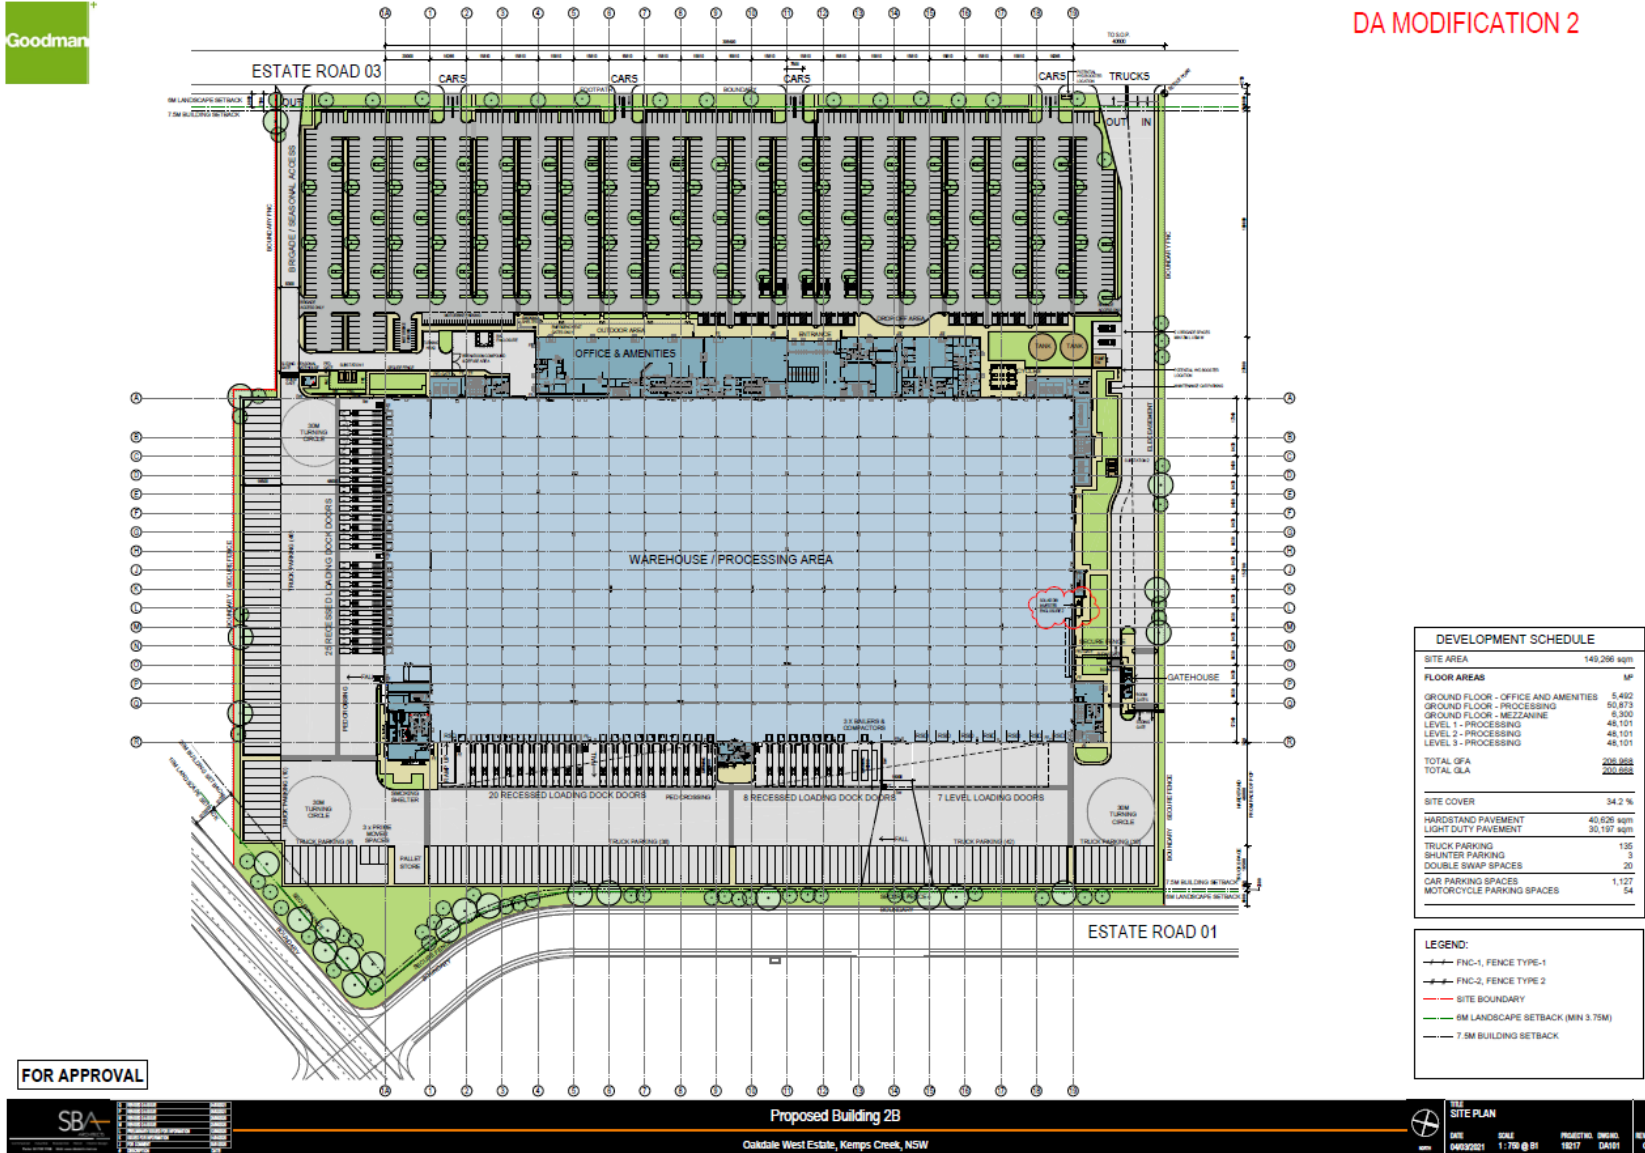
Landscape and Ground Floor Plan (Mod 2 – Plan 1 of 4)
